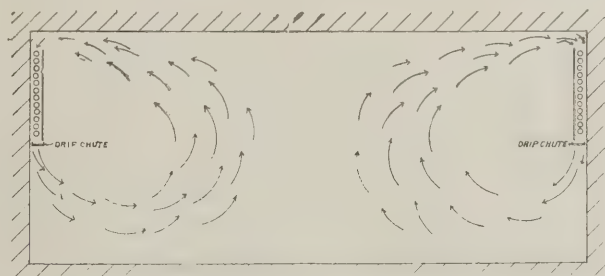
NATURAL AIR CIRCULATION WITH WALL PIPING.
